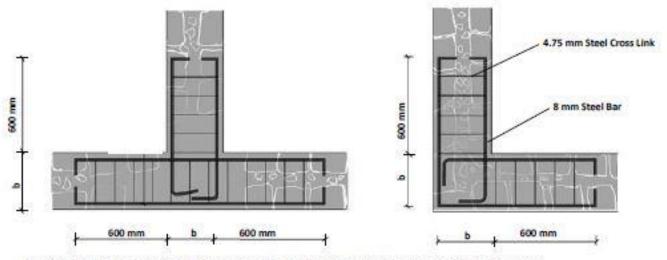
Wall stitches made from reinforced concrete with steel reinforcement (adapted from: Bothers et al. 2002)
